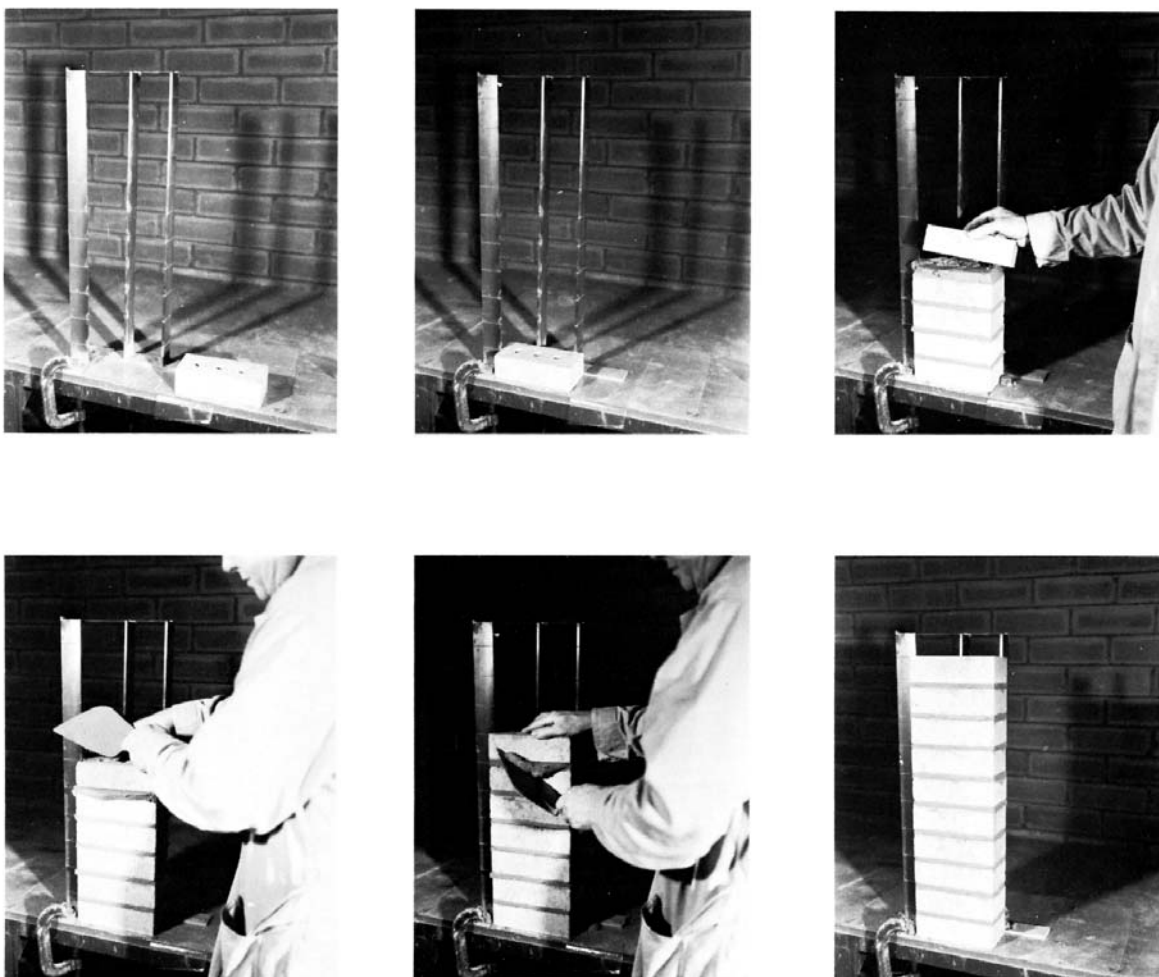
Use of a Jig to Align One Face of a Prism to a Plane
